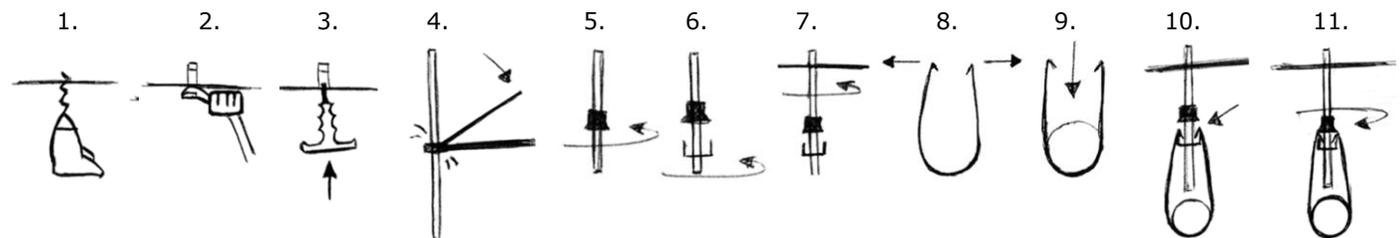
Use of flexible armover between foundation roof and suspended ceiling.
